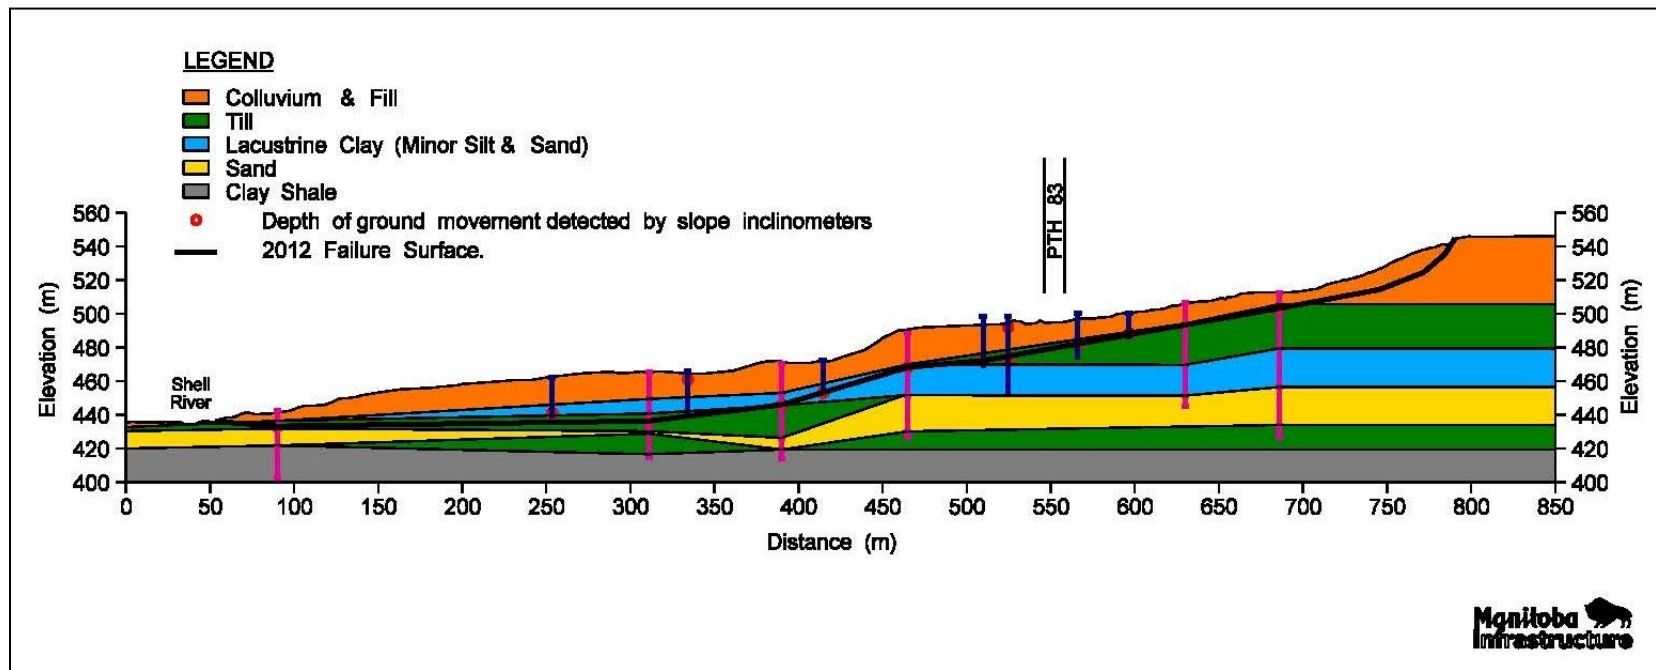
PTH 83 Shell River Landslide Cross Section B-B – Showing geology and failure surface
